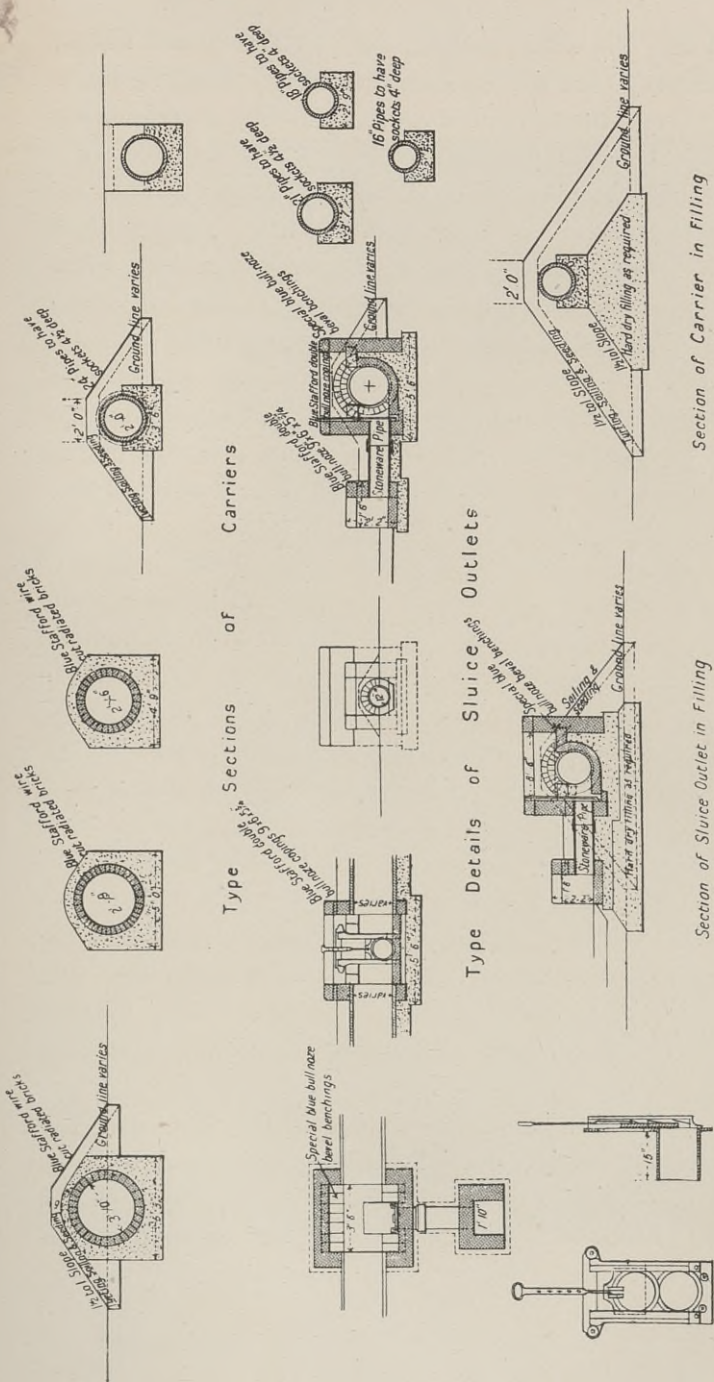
Laying Out Lands for Sewage Purification. Details of Carriers and Sluice Outlets at Birmingham.
